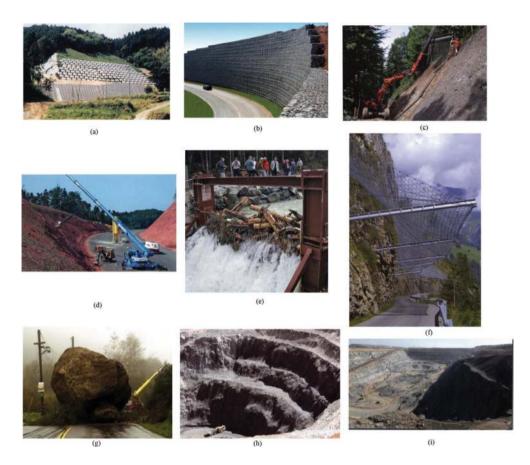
(a) Anchor construction—Japan. (b) Strengthen wall—Switzerland. (c) Slope defense by flexible metallic net— Switzerland. (d). Slope protection by flexible metallic net—Switzerland. (e). Barrier for retaining debris flow—Switzerland. (f) Ring metallic net protection above road against rockfall—Switzerland. (g) Big stone on the road. It is possible to make it fall down, to break, or to reinforce by cement on the slope of the road. (h) Rock slope surface stabilization and rockfall hazard mitigation using coated double-twist rockfall mesh. Australia. Mining company Barrick (Australia Pacific) Ltd., 2010. (i) Rockfall mitigation drapery using double-twist rockfall mesh - South Africa. Mining company Anglo-platinum, 2009.
